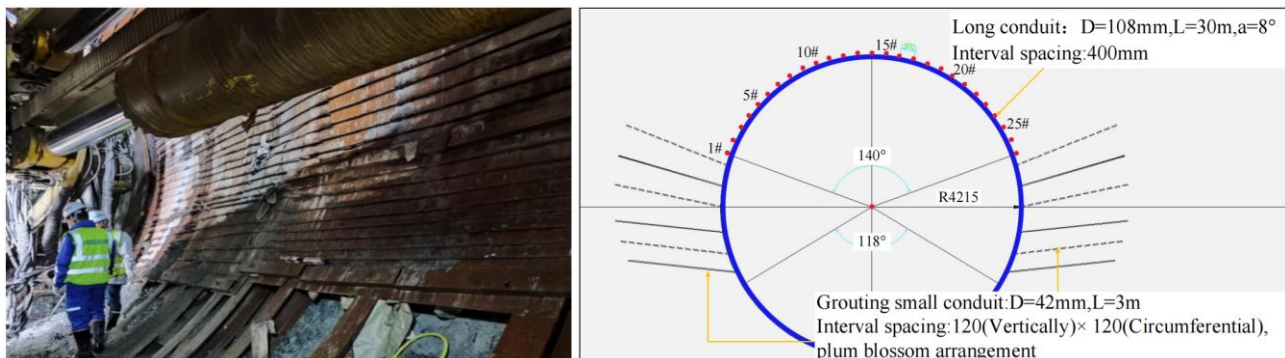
Construction site diagram and schematic diagram of the surrounding rock reinforcement at the TBM gripper shoe
